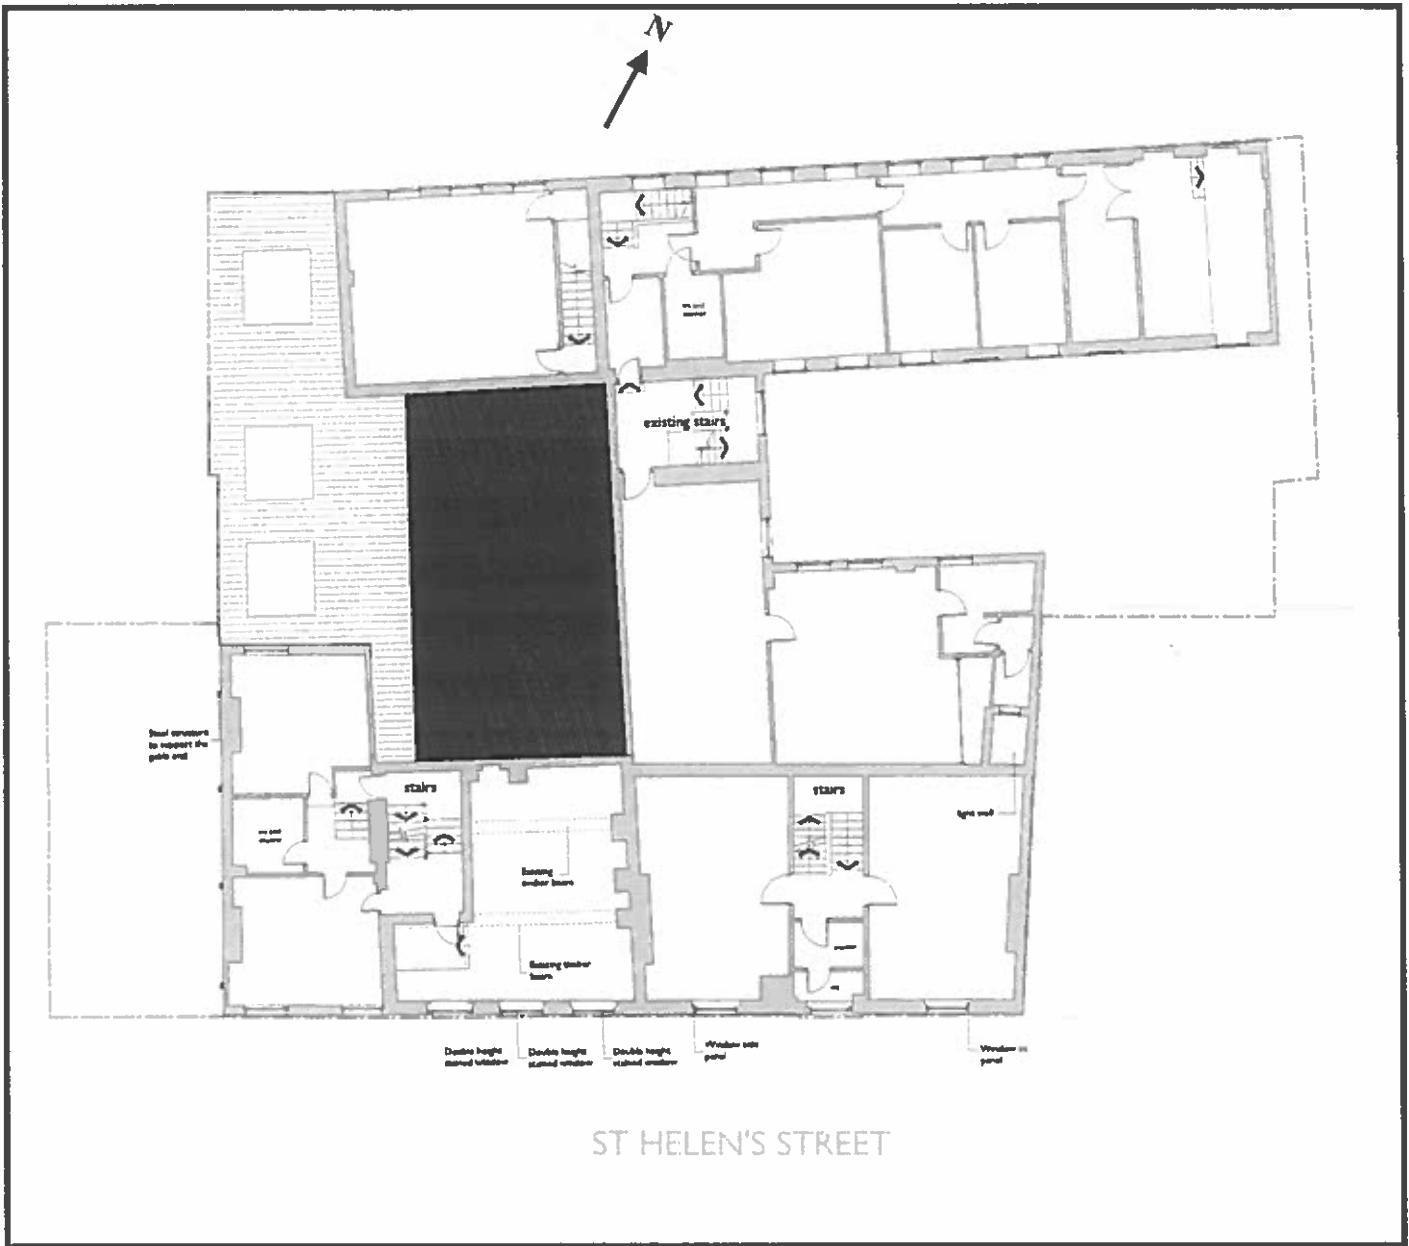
Present first floor plan of 10-14 St Helen's Street, Derby. Scale 1:200.
